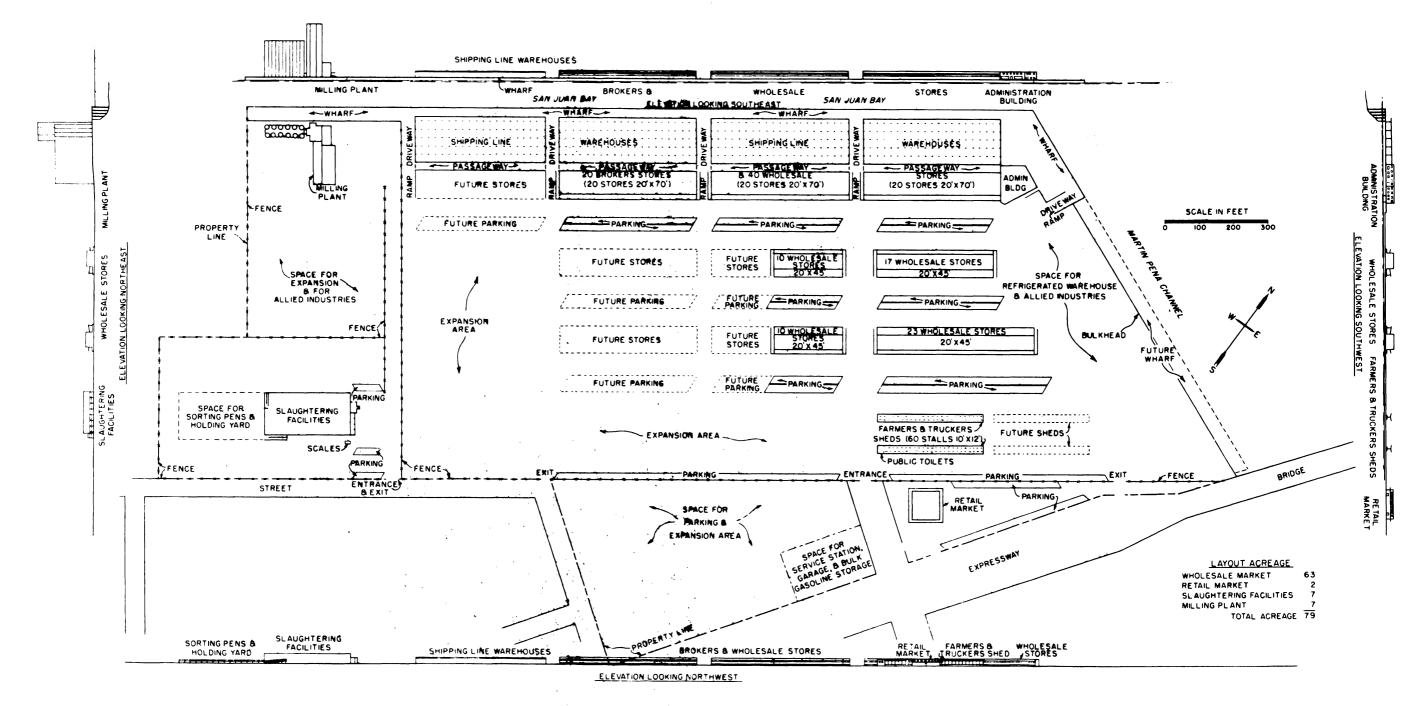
Proposed arrangement of facilities for a wholesale market on a site southwest of Martin Pena Channel, San Juan, P. R.
